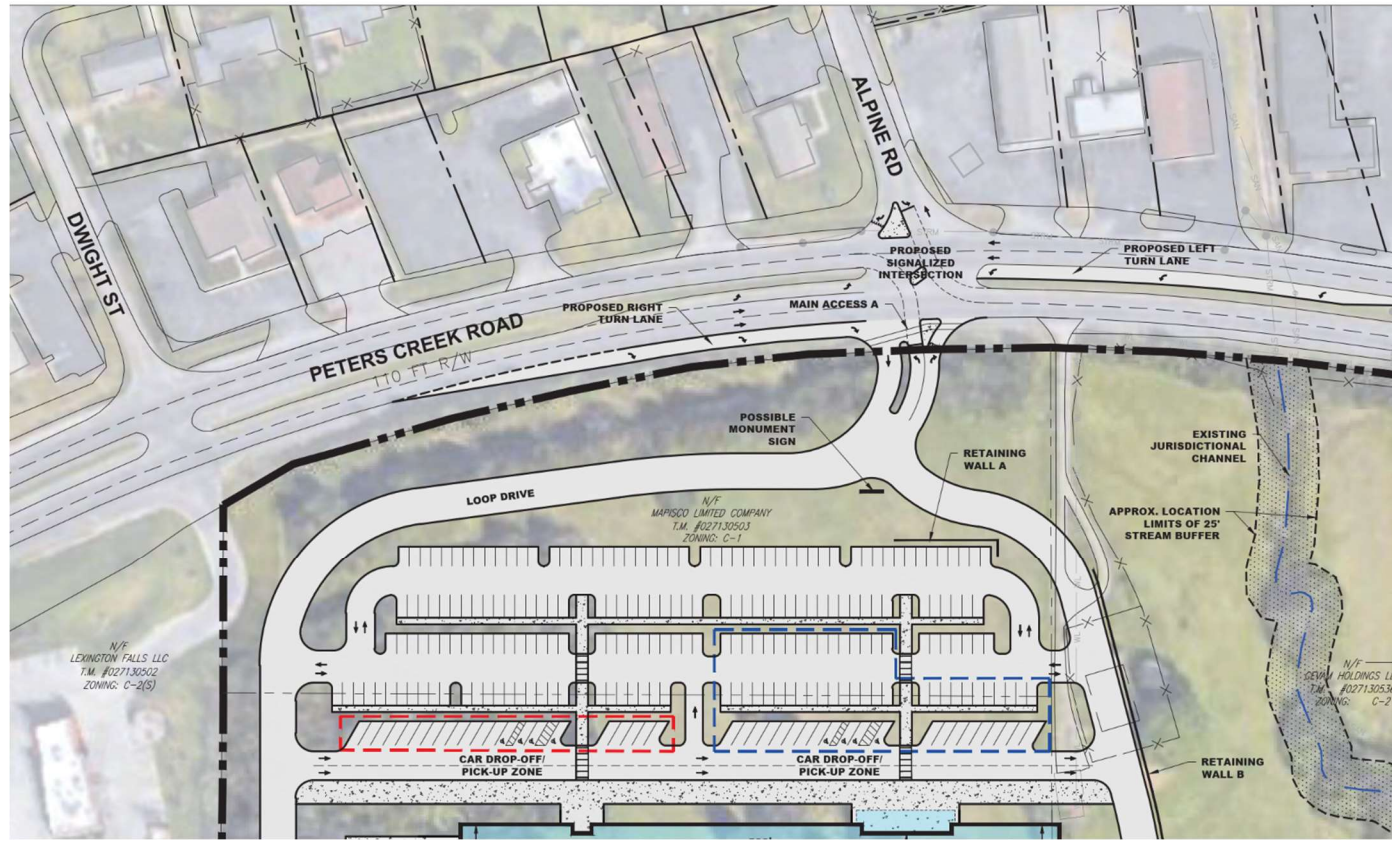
Peters Creek Road at Alpine Road Planned Improvements
